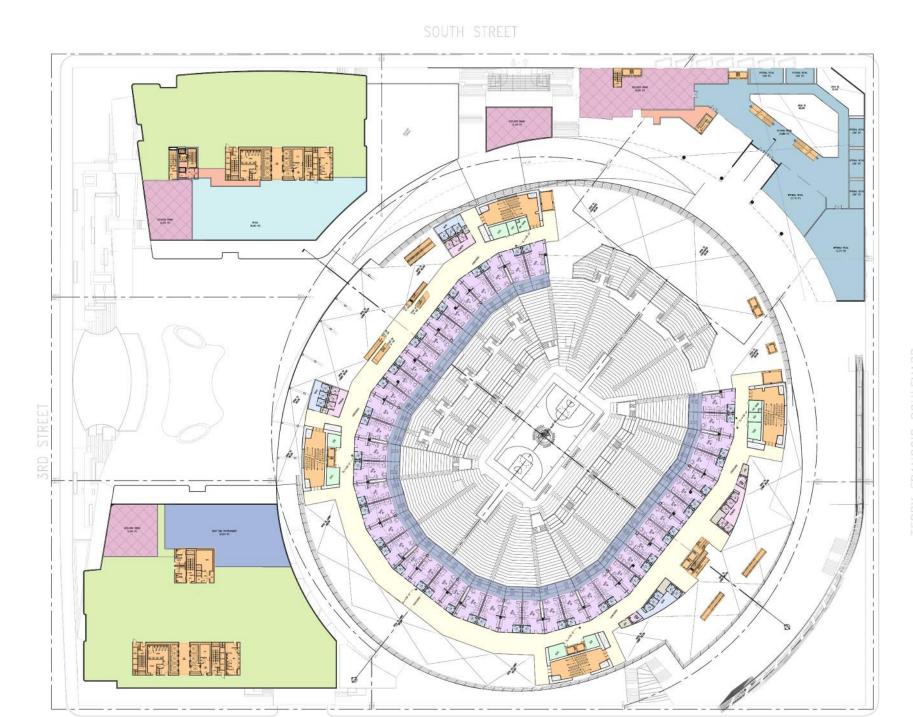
<u>Suite Level:</u> Traditional Suite seating options for Event Center attendees, located at +39'0" <u>Food Hall Roof:</u> Roof height of the northeast corner structure will measure +41'0"
